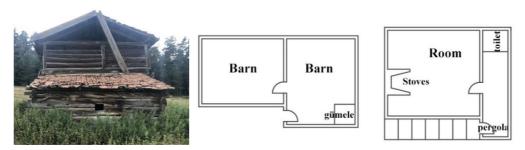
Gölcük Highland Dwelling (Soydan, 2024), ground floor and first floor plan (drawn by the author)
